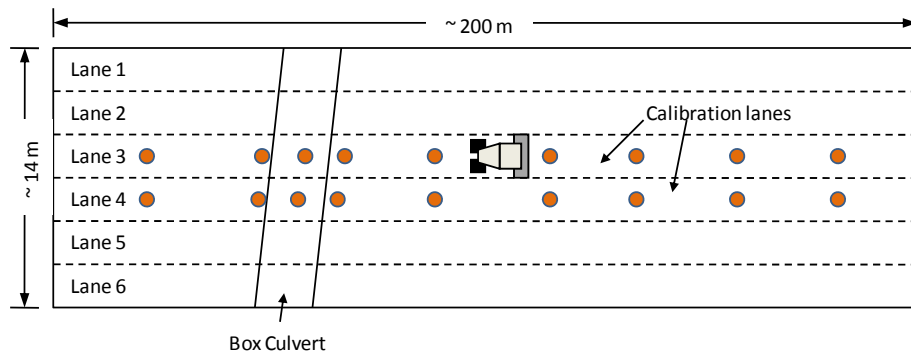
Experimental testing setup on TB5 (lane 3 for padfoot roller calibration strip and lane 4 for smooth drum roller calibration strip)
